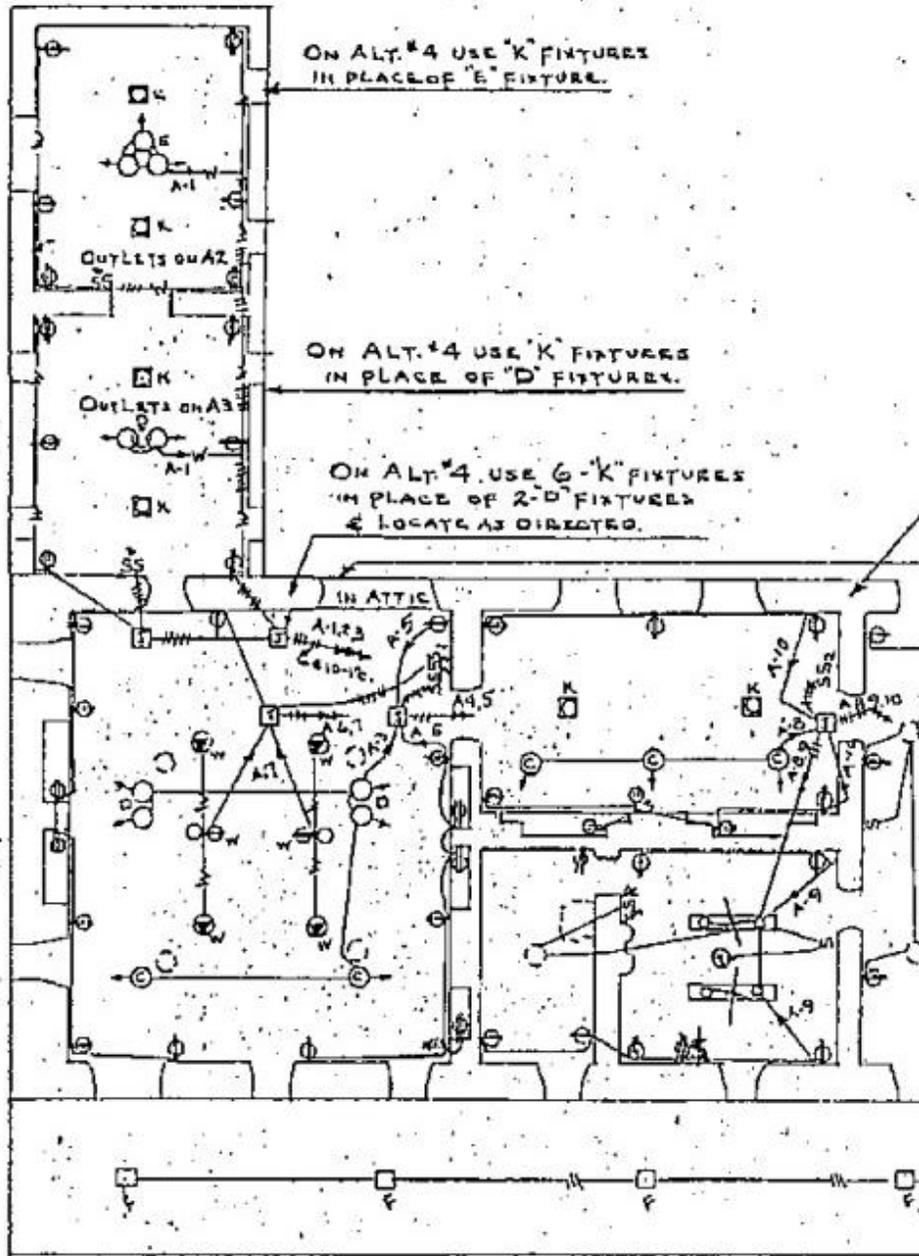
Detail from an electric plan hand dated 1955 (Conron and Woods 2004:Appendix N, 22).
